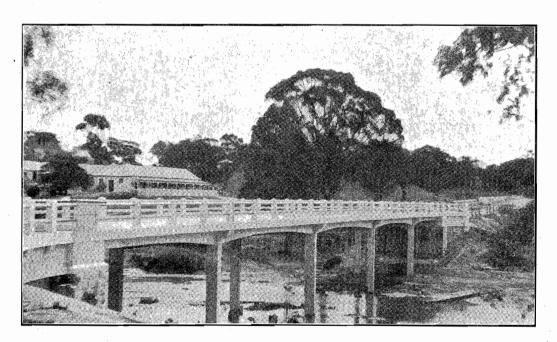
Reinforced Concrete Bridge at Pyalong.
